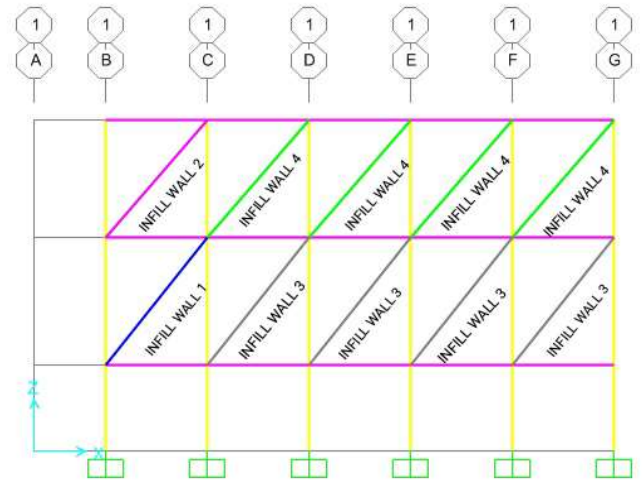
Infill wall positions for equivalent strut calculation Infill Wall 1 (without openings)
